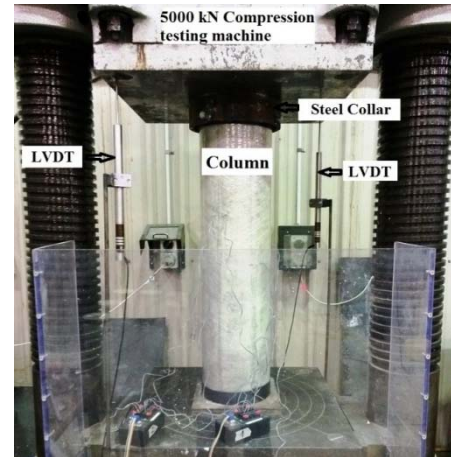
Setup for testing of columns in 5000 kN Denison Compression Testing Machine
